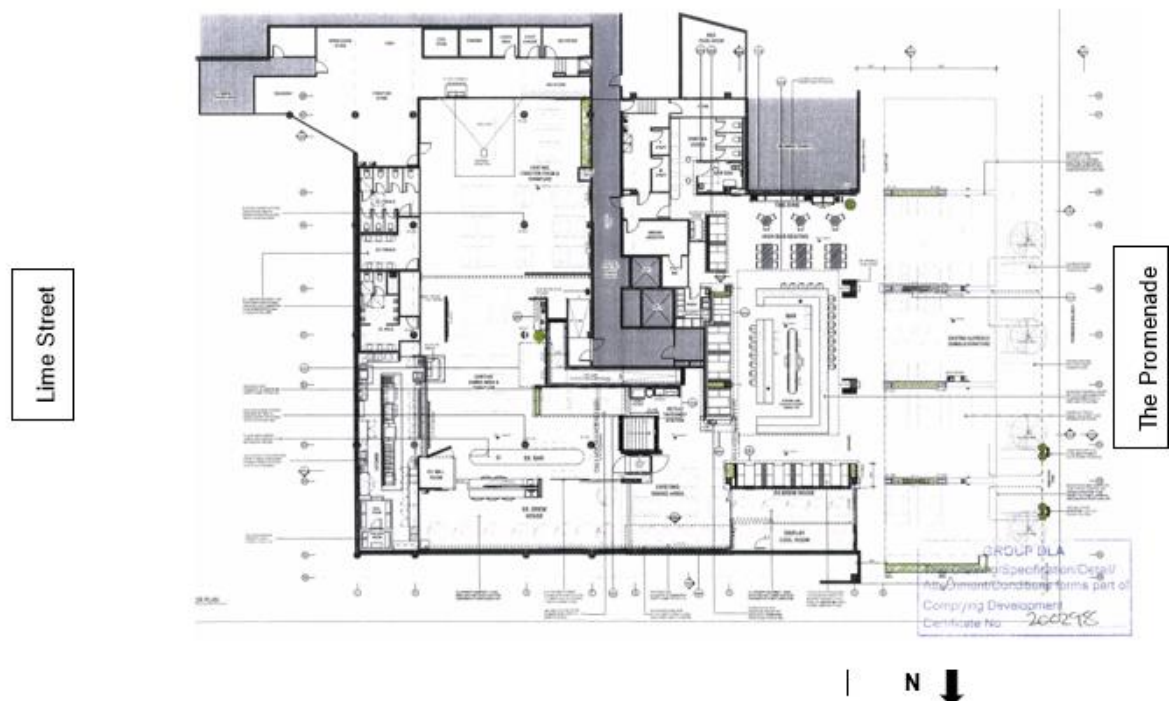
Approved floor plan of the tenancy under P/2020/1744
